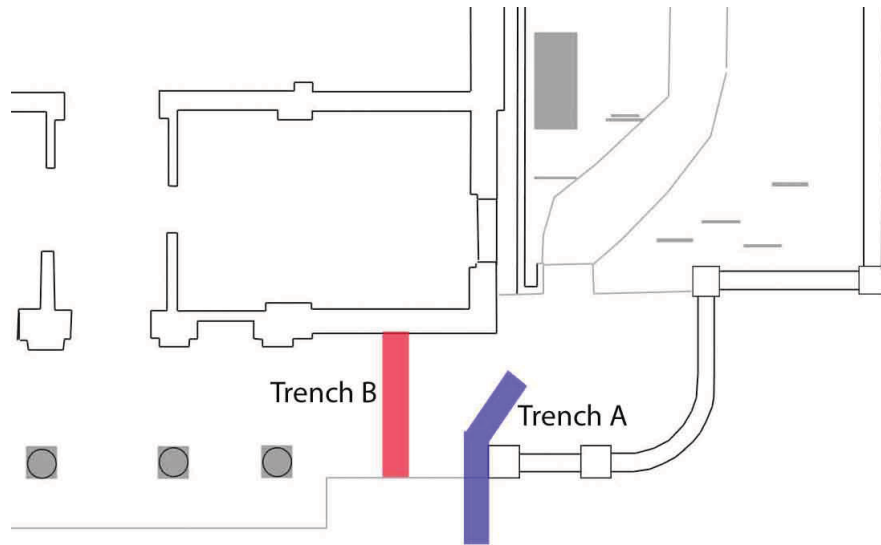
Plan of south-west corner of church and boundary wall, showing location of drainage installation trenches.
